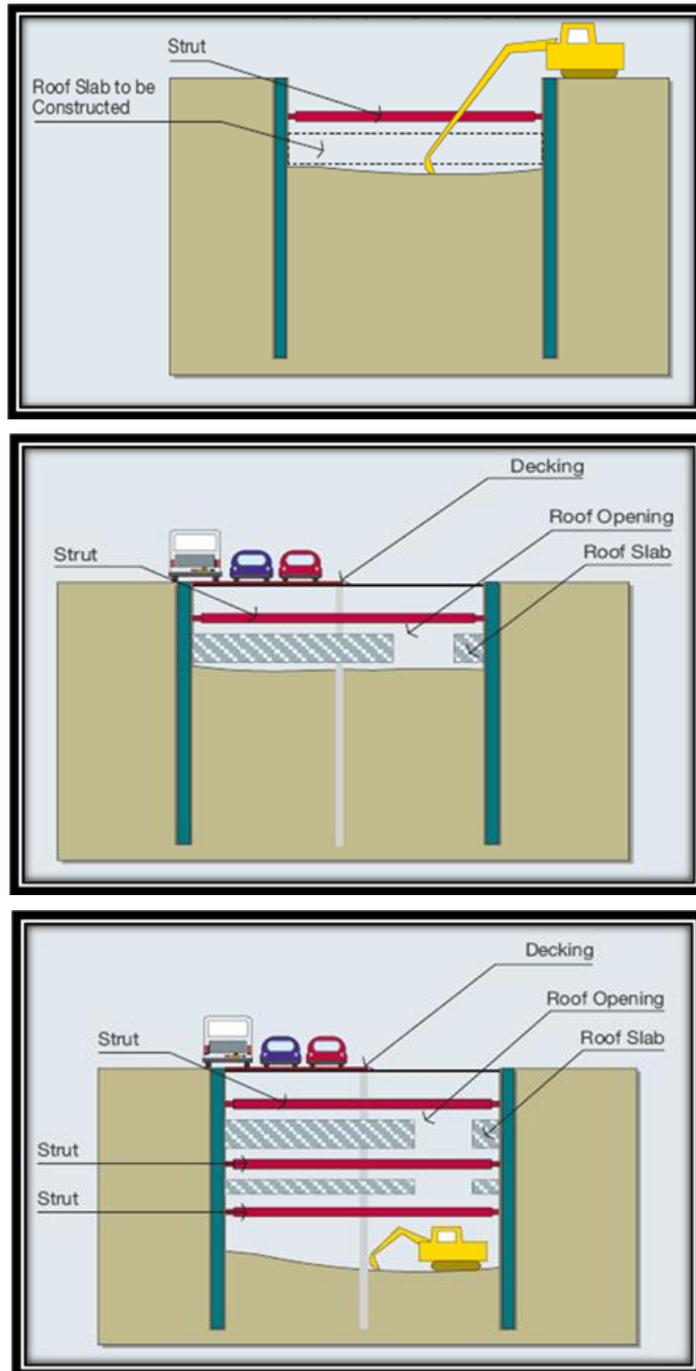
Traditional top/down construction method (<https://www.haxworld.net/civil/top-down-construction-method/>)
